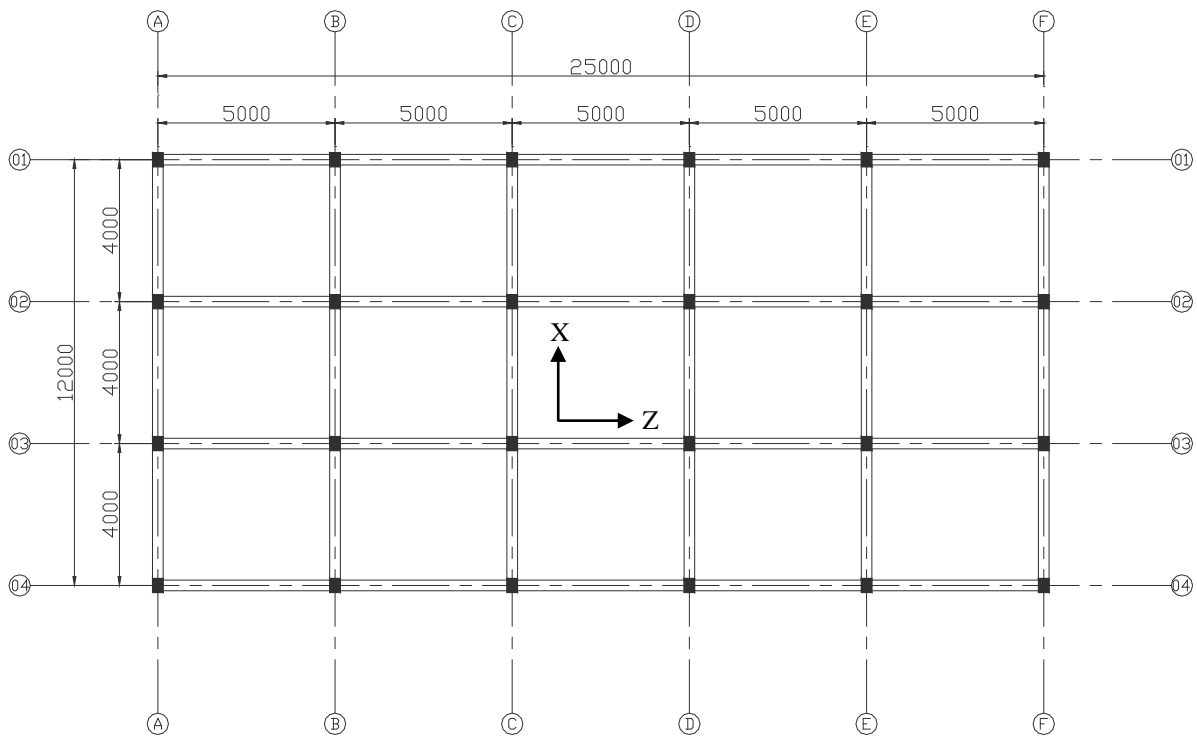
Plan of two, six, and twenty-story regular RC buildings (all dimensions are in mm)
